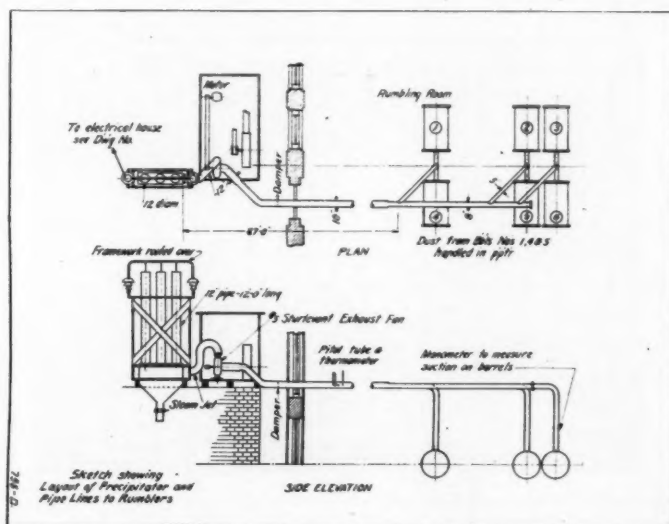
ARRANGEMENT OF TEST COTTRELL INSTALLATION TO TREAT AIR FROM FOUNDRY TUMBLING BARRELS
